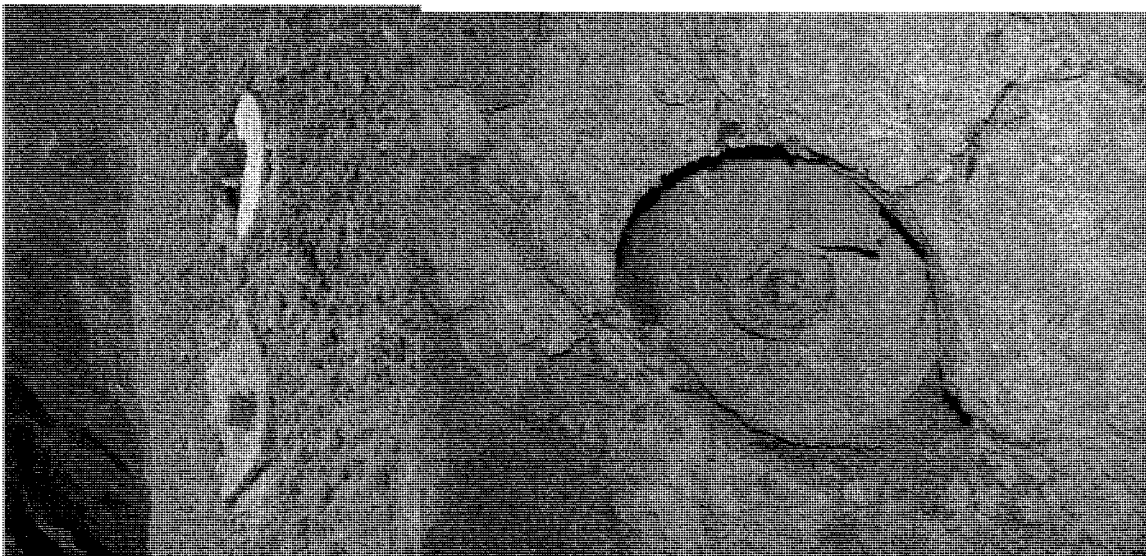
Bent bolt plates and nut pushed through the spherical ring
